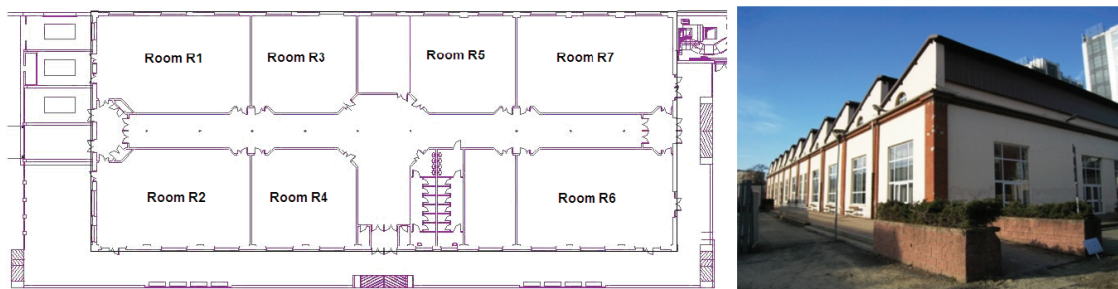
Layout of the building heated and air-conditioned by the desiccant trigeneration plant
